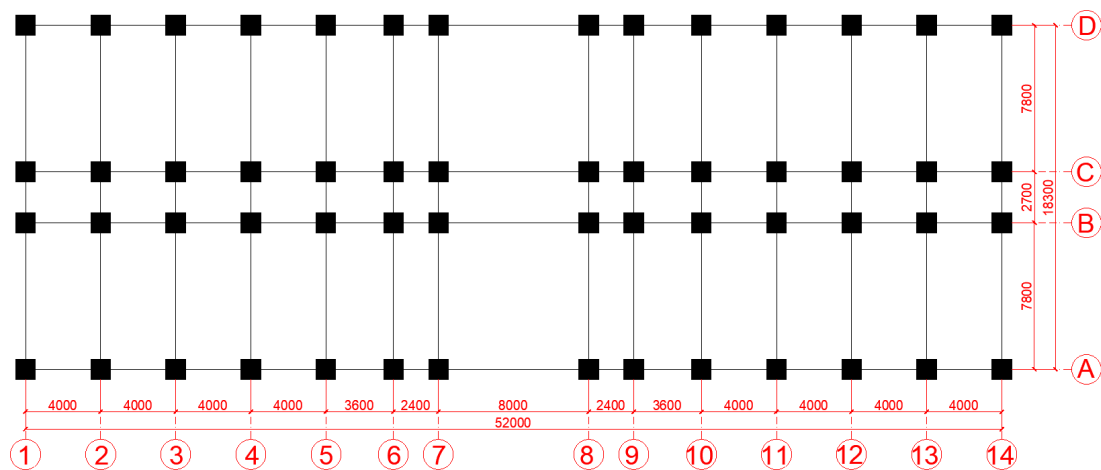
BUILDING'S DESIGN SCHEME LAYOUT
